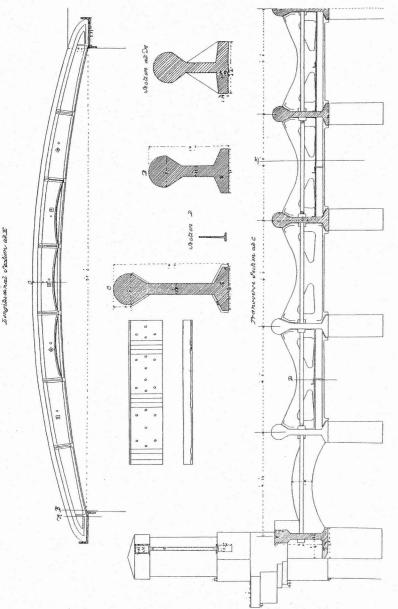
Details of the ironwork of the main span from the Trevithick drawings: (a) elevation and-sections of a main girder; (b) part cross-section, including an edgebay on the left. (Library of the Institution of Civil Engineers.)
